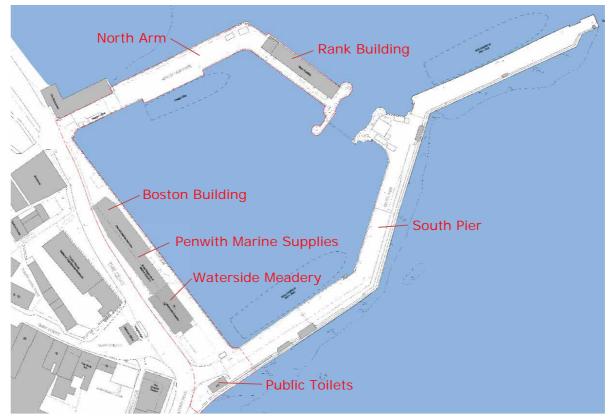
Existing plan of Area 1 showing locations of buildings and structures.
